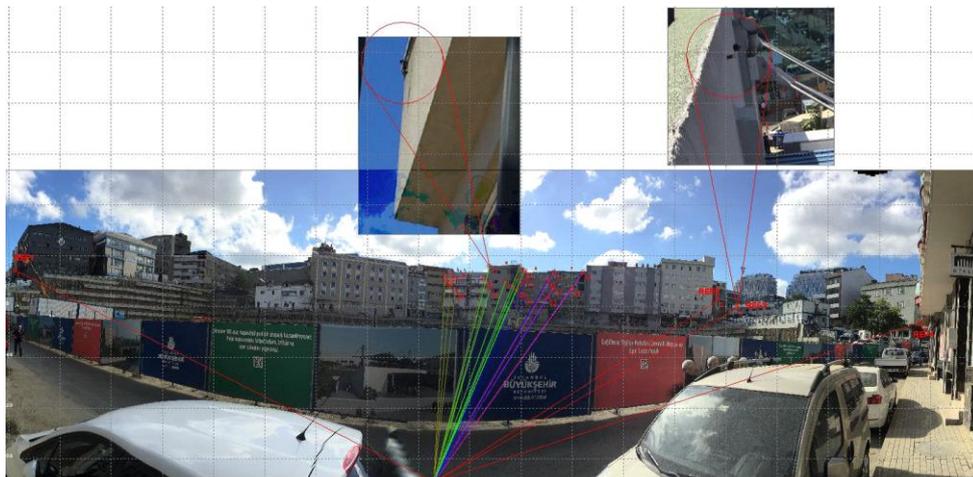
The view of underground parking construction, the monitored buildings and the monitoring prisms and reference points.
